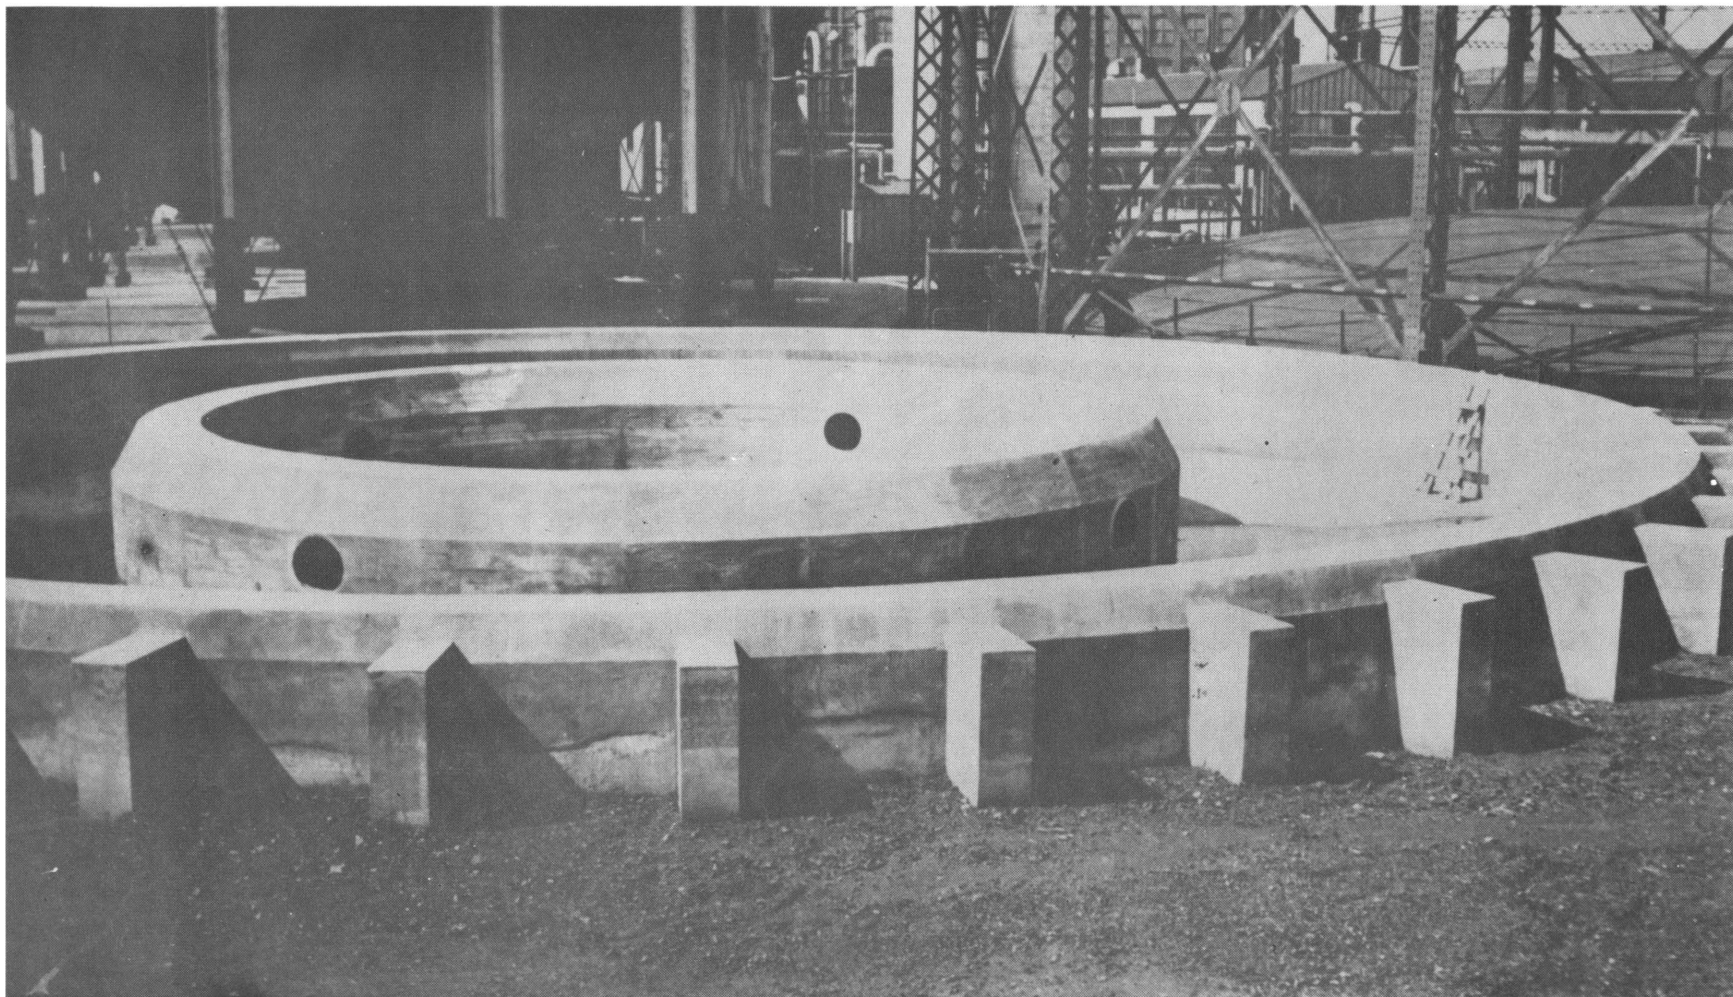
Completed foundation for toro-segmental tank, showing ring-shaped footings with pilaster on outside of outer footing.
